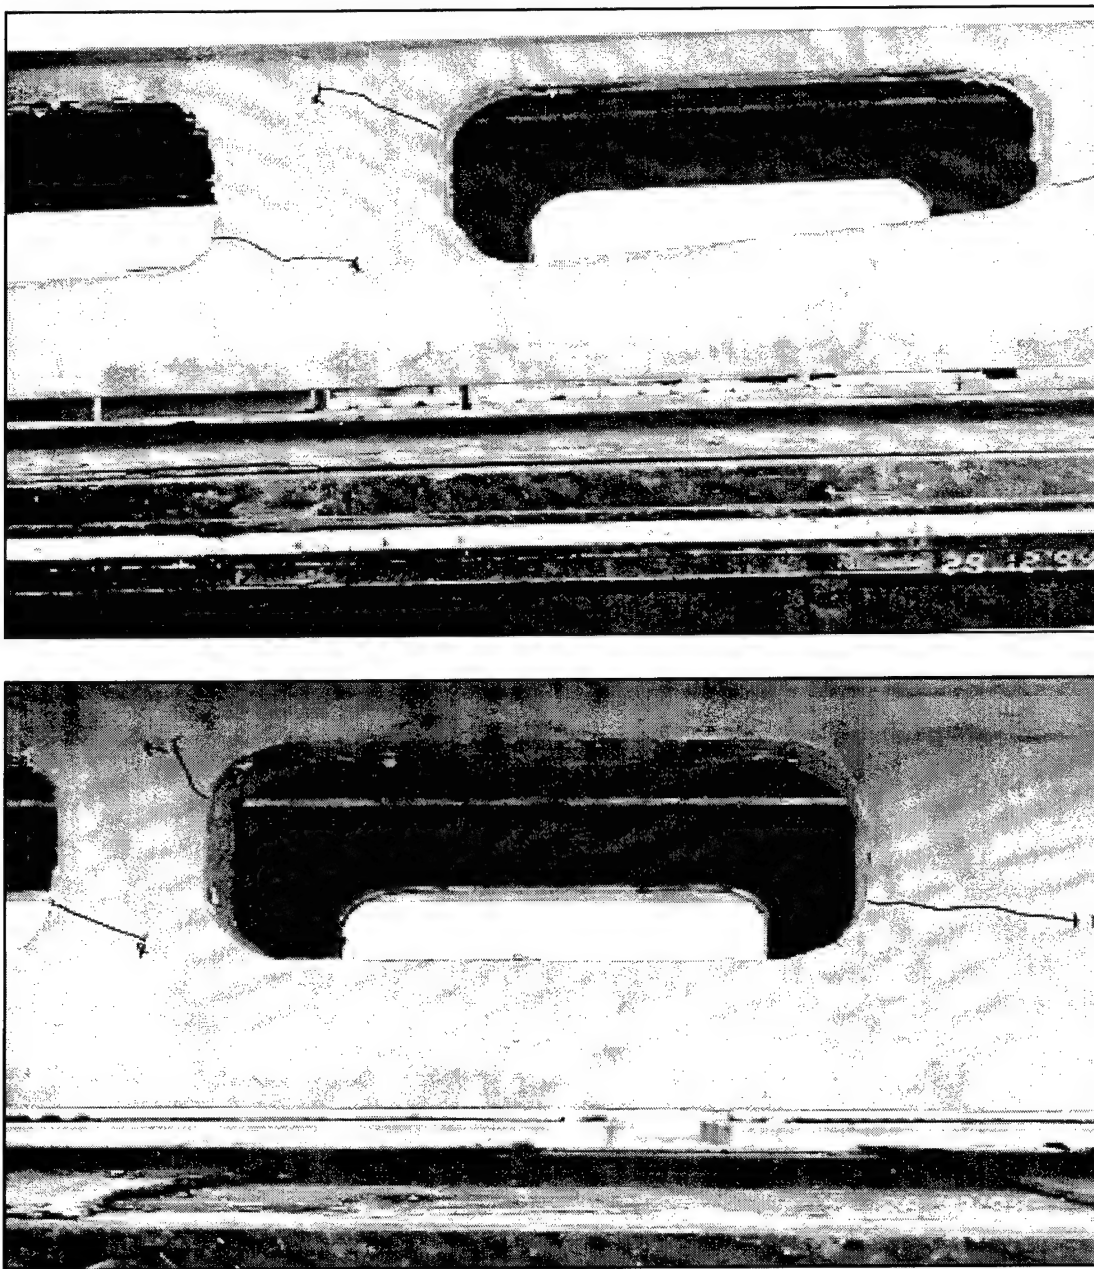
Specimen cracks at release of prestressing strands.
